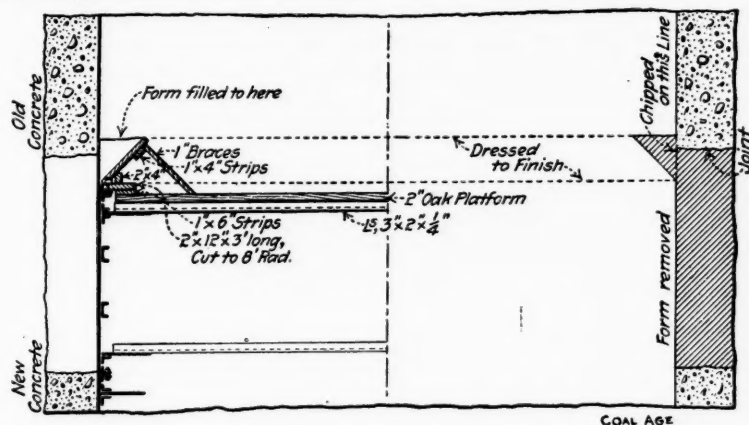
DETAIL, SHOWING METHOD OF JOINING OLD AND NEW SECTIONS OF CONCRETE LINING
